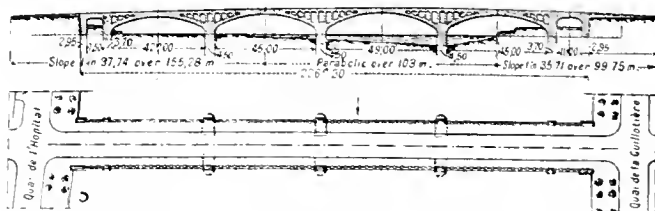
PLAN AND ELEVATION OF THE WILSON BRIDGE
